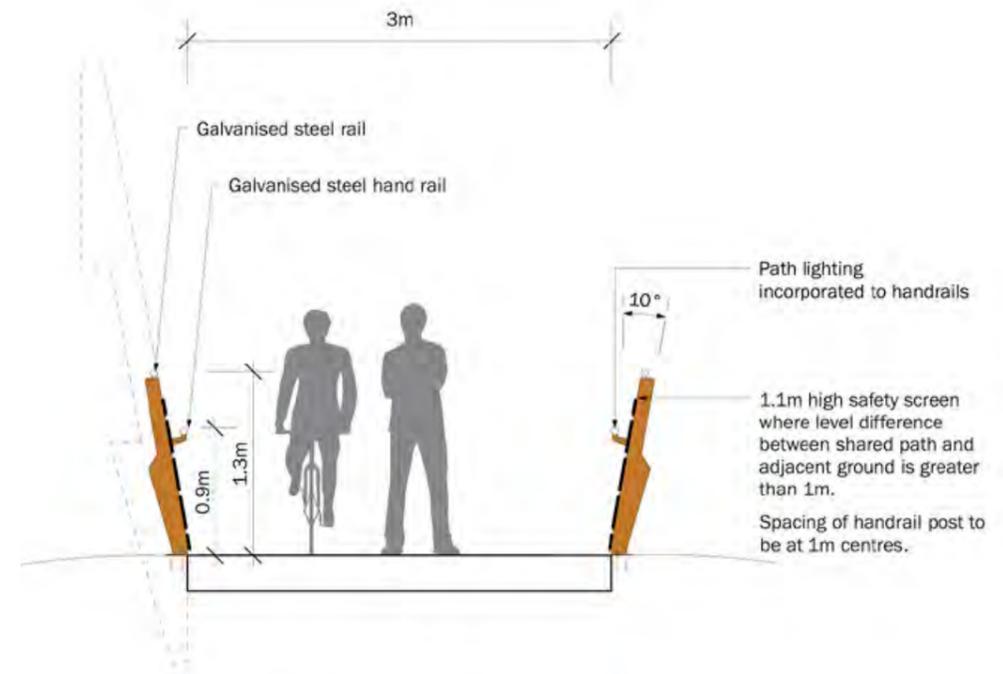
Shared path near Bridge over Mount Ousley Road - Section (Scale 1:50)
